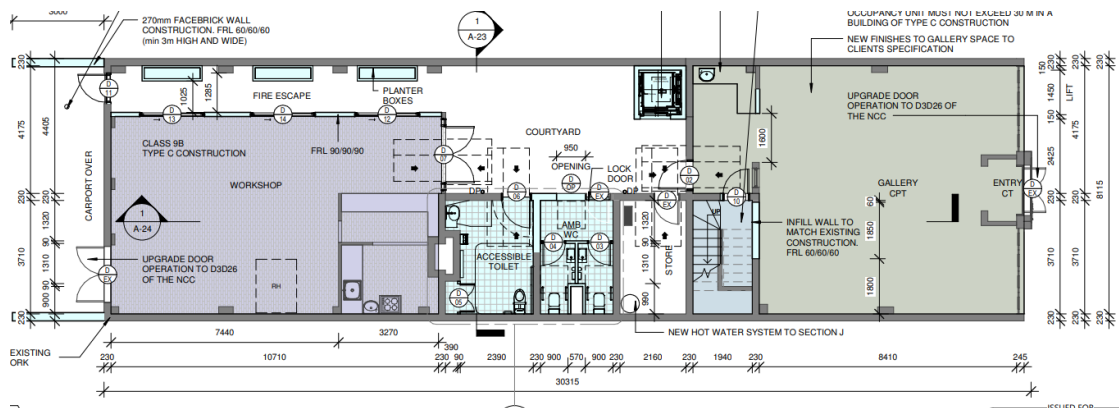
11 Montague Street Goulburn proposed ground floor plan (Source: TLA)
